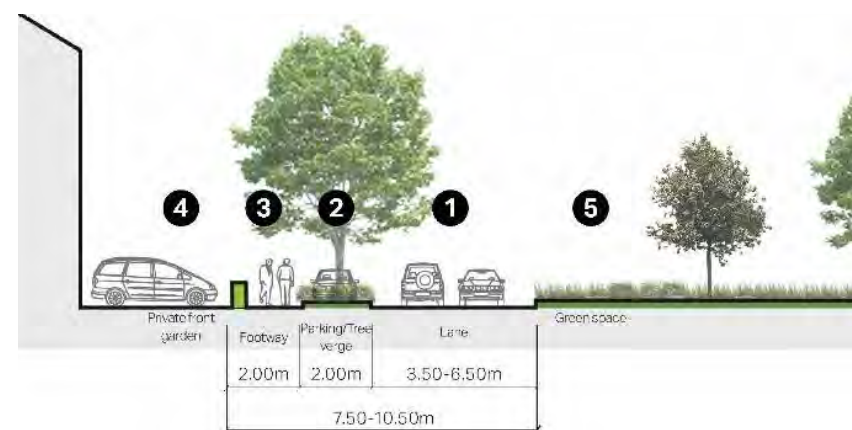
Cross section showing potential approach to Warren Farm development frontage along Roxwell Road as illustrated in the Writtle Design Guide. Key to image: (1) Shared Lane, (2) Verge, (3) Footway, (4) Residential gardens, (5) Landscaped green space. Opportunities for incorporating cycle lanes, potentially integrated within the green space, should also be explored. See the Writtle Design Guide for further information.
